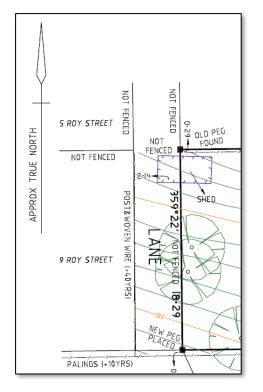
Feature Plan of Proposed Part Road Discontinuance
